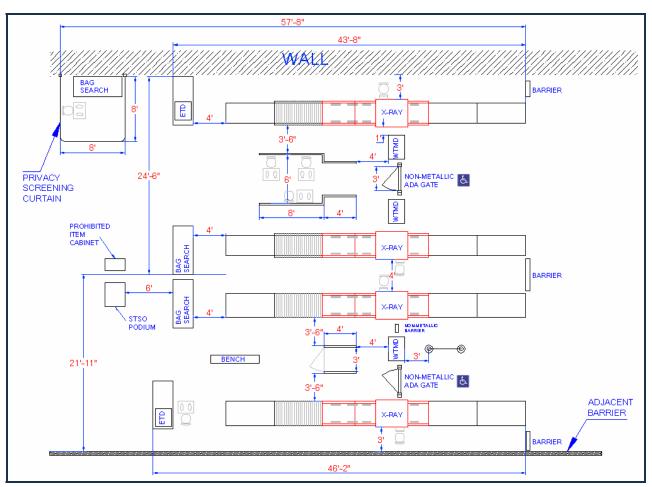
Example Layout of SSCP Minimum Spacing Requirements
